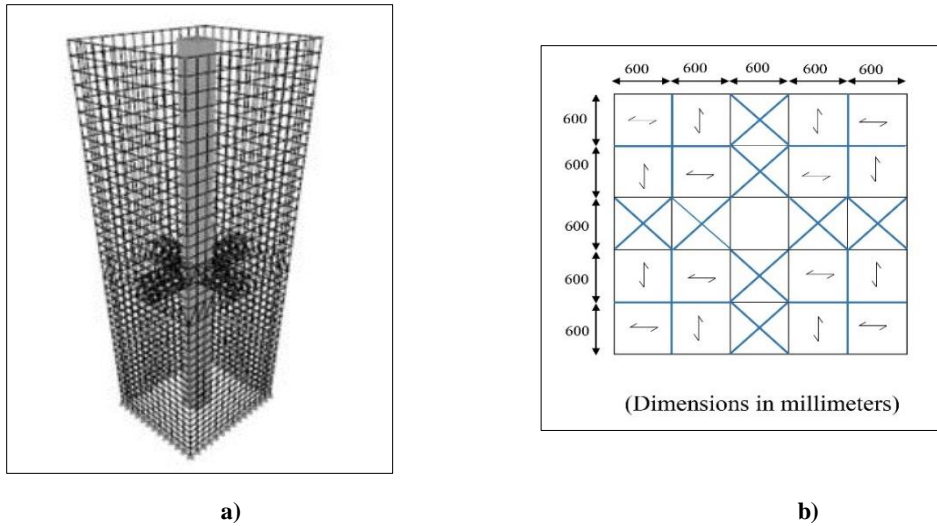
a) Modeling of tall building with outrigger and belt truss system, b) Plane of building
